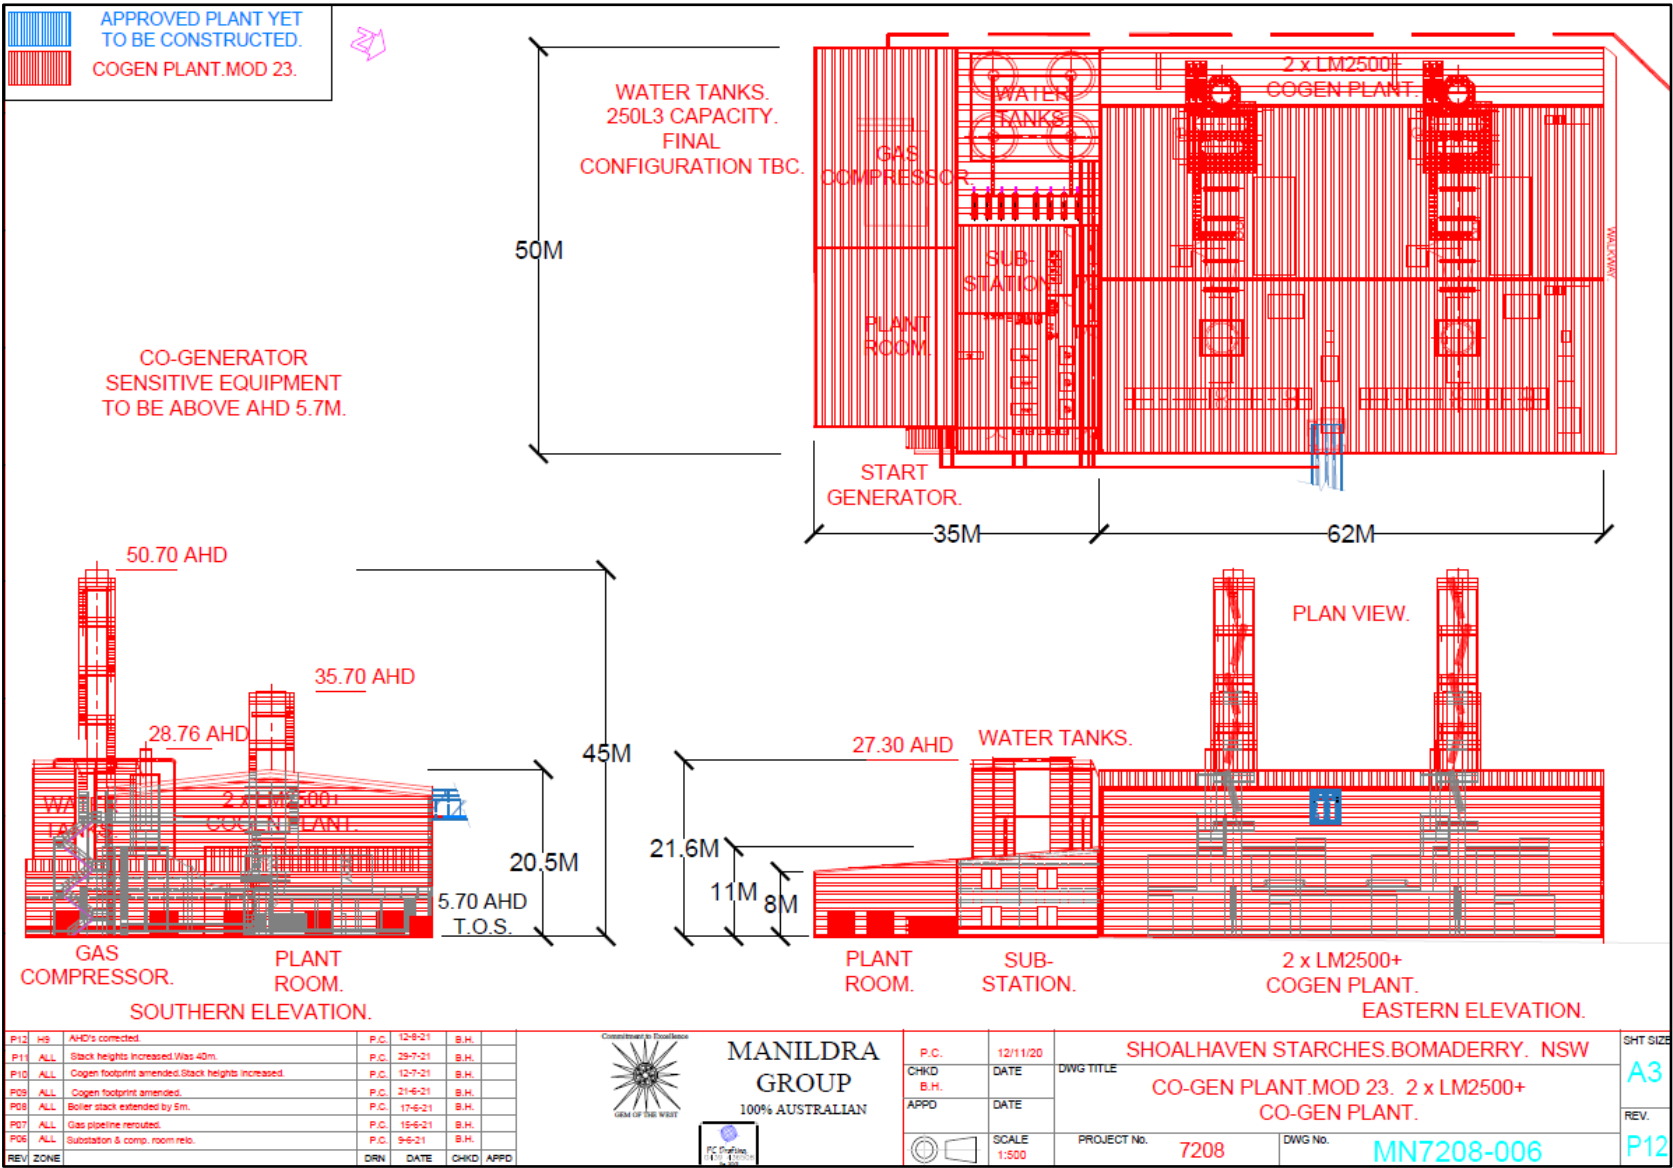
Floor plan and elevations of gas fired co-generation building and associated plant.
